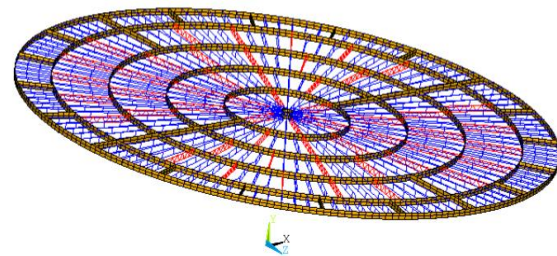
Elemental configuration of the intermediate stiffeners of the roof (red: trusses, blue: rafters, brown: bulkheads)
